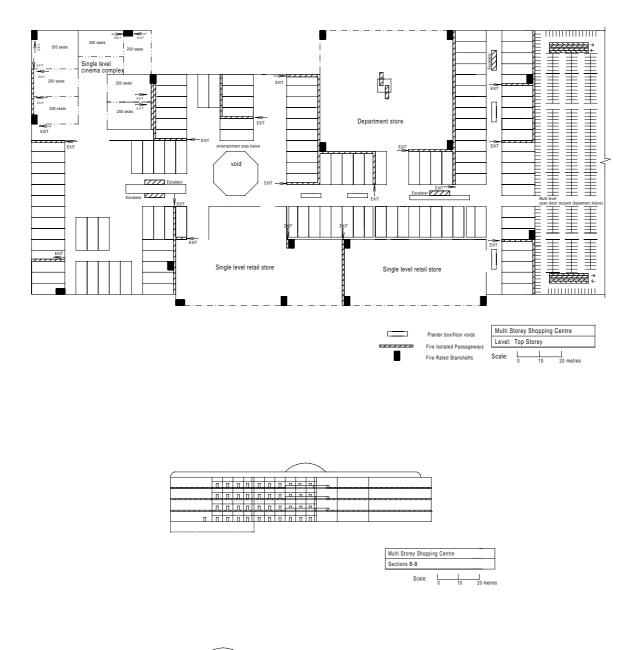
BUILDING LAYOUT (CONT'D)
